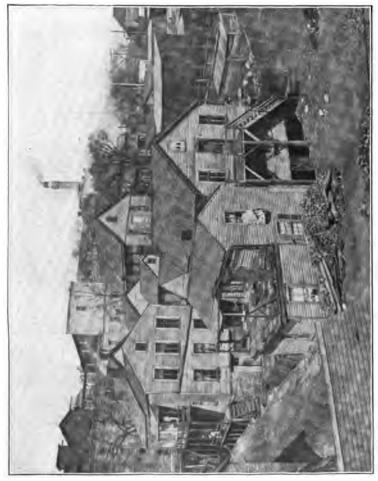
Illustration IV.—Typical rear dwelling sought out by groups of foreigners. Building in center already condemned by City Building Inspection Department. Building still occupied, one room by nine Hungarians, two by eleven Slovaks, and two by nine Hungarians. In some cases the occupants have less than 160 cubic feet of air space each. The rooms are most insanitary and the cellar filled with refuse.
